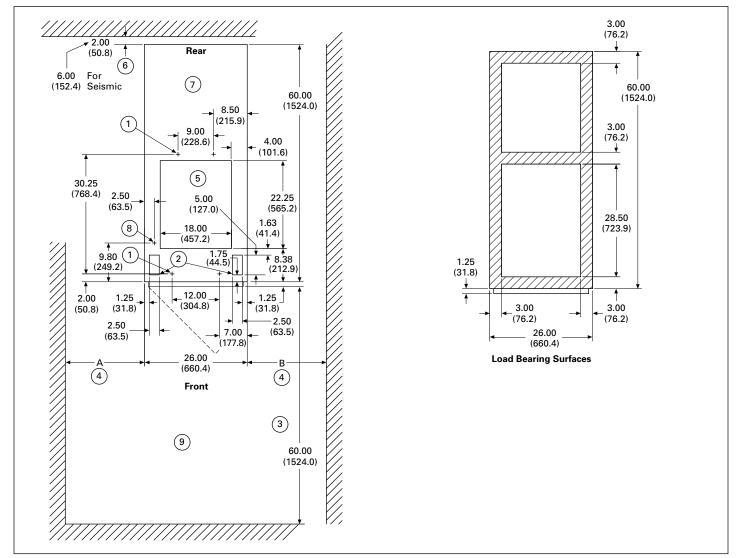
MEF 26.00-Inch (660.4 mm) Wide Unit Floor Plan
